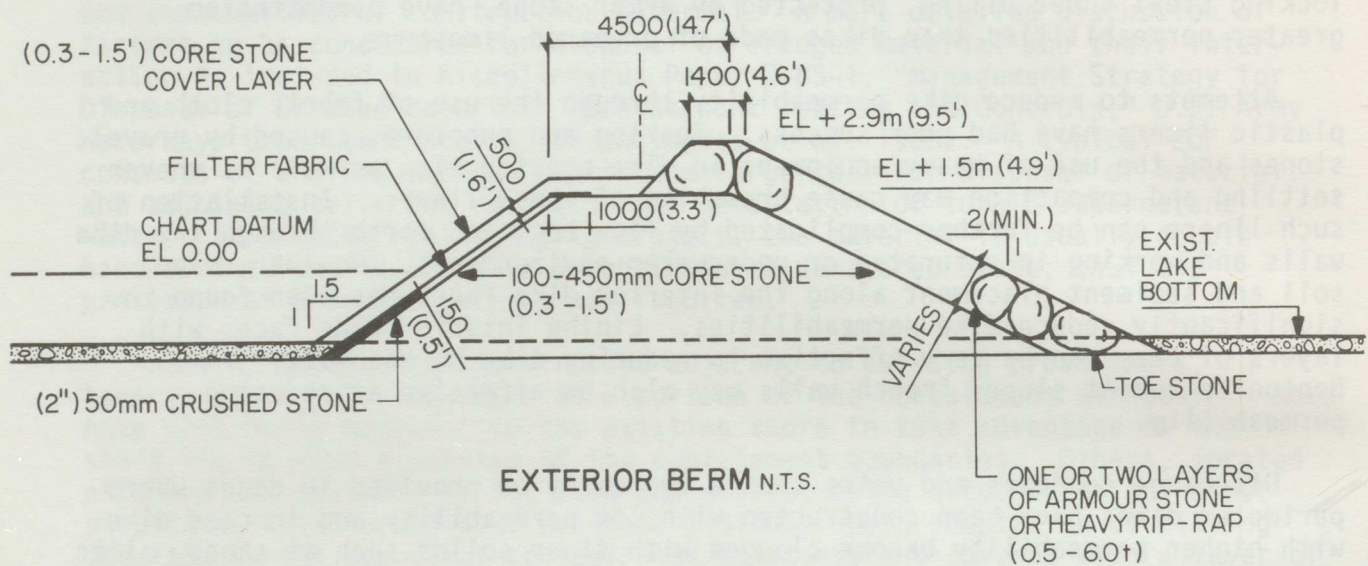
TYPICAL BERM CROSS-SECTIONS
